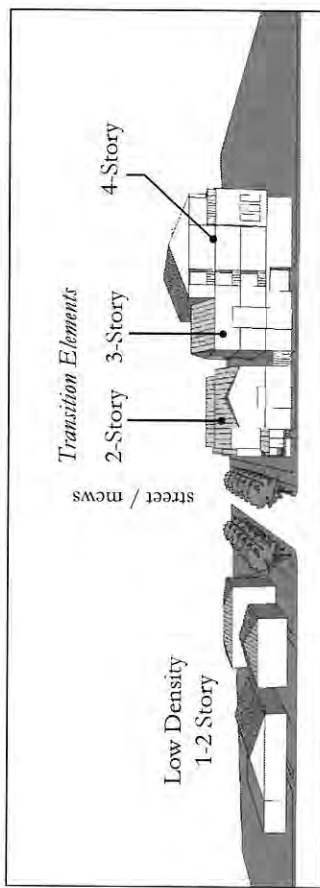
Transitions can also be made by stepping massing down within a project, with lower building elements providing a buffer between taller elements and adjacent lower-density development.
